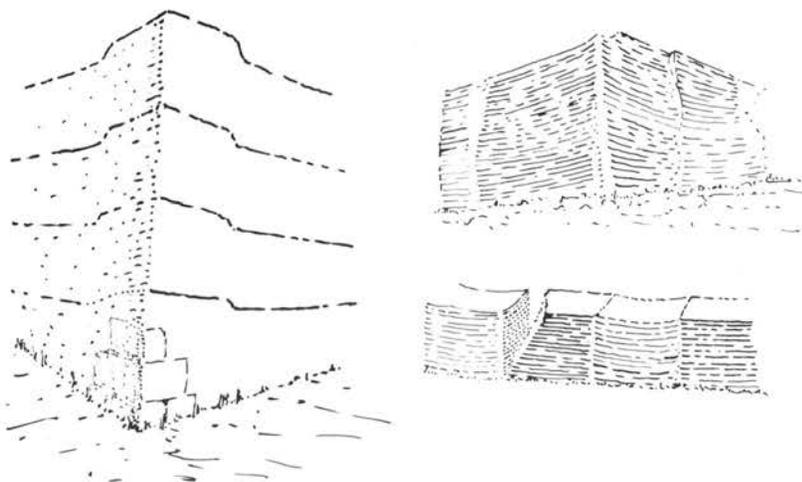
Left: Angle of massive wall in traditional construction showing terminal upstand to act as brace or buttress against angle or end collapse during process of drying; right: Sag or Pan bed mud brick construction in massive Egyptian enclosure walls (after Petrie Egyptian Architecture figs 13 and 16).
